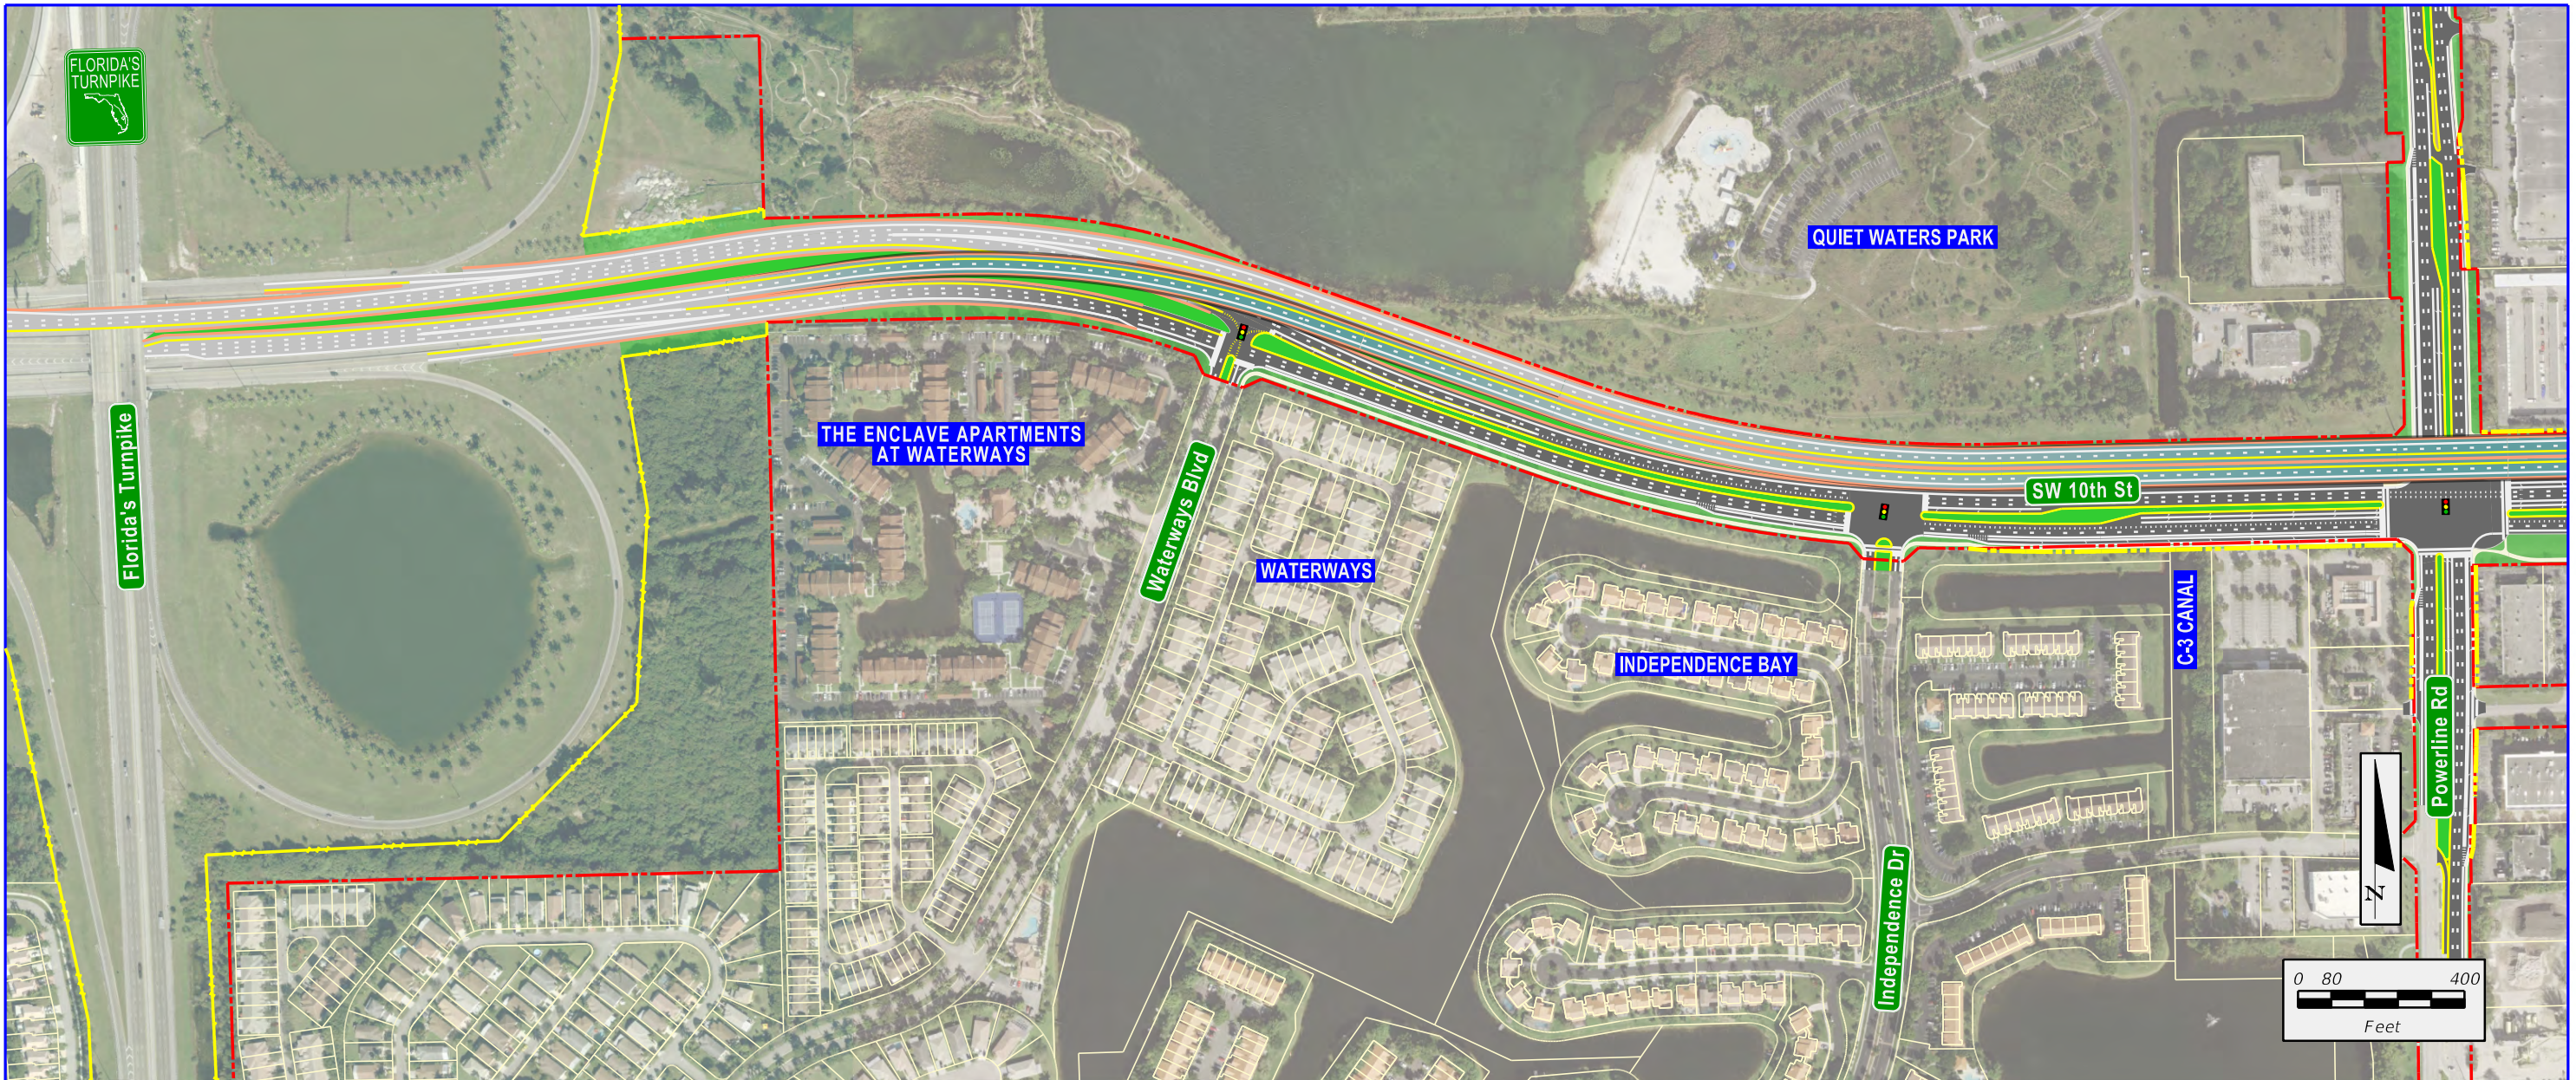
depicts the plan and profile of the Depressed Westbound Exit Ramp Alternative.
